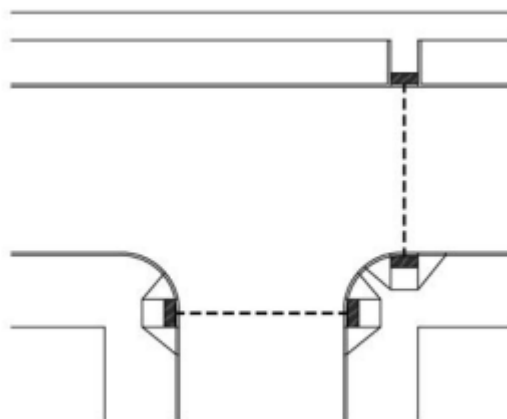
Provide at Least One Crossing of Each Street at a T-Intersection
